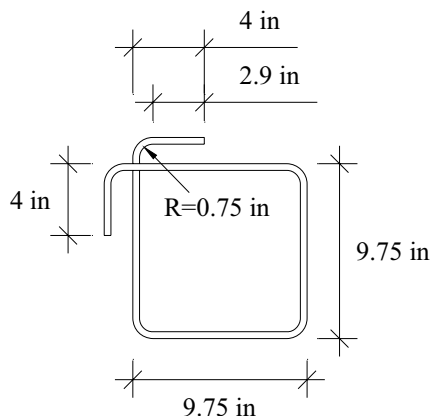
Tie Detail; Specimens E1, E2 & E3
